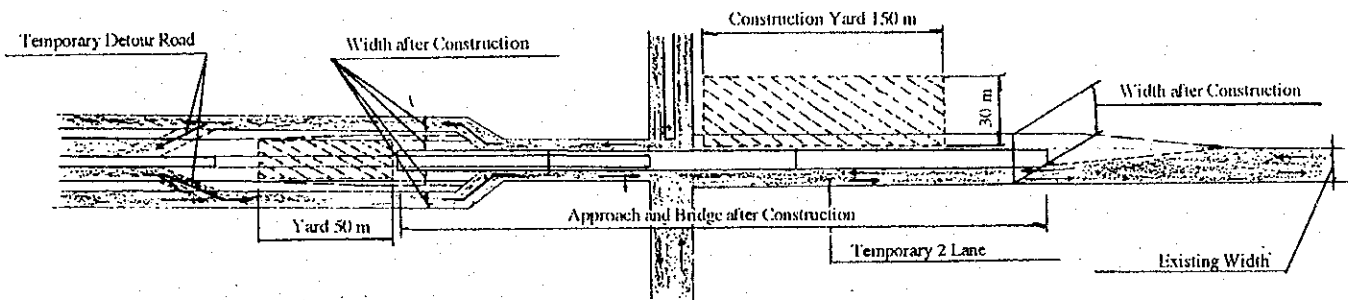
Plan of Temporary Traffic Diversion ( East Cross Rd.)
